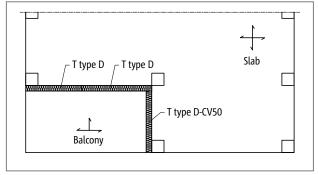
Schöck Isokorb® T type D, QZ; Z: One-way spanning
